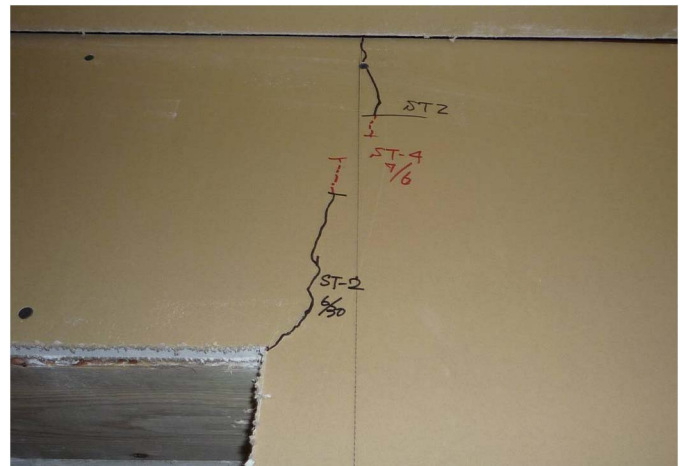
Crack on Wall 2A, Story 5 (over door opening) after Seismic Test 4
